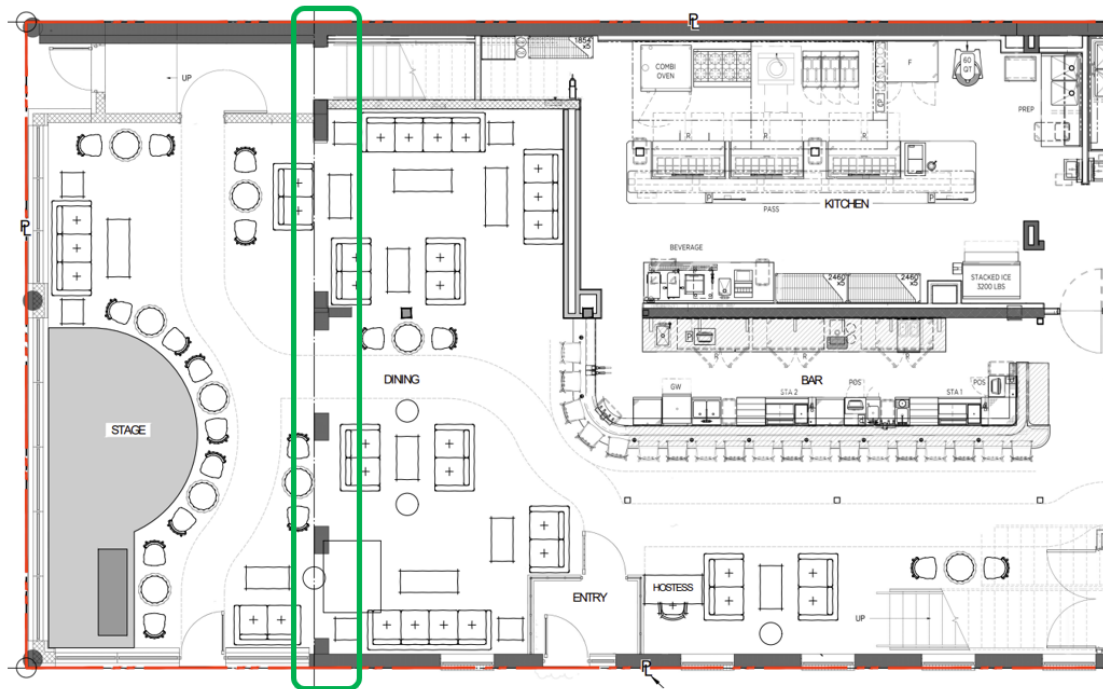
Excerpt of First Floor Plan. Original columns marked in green.
